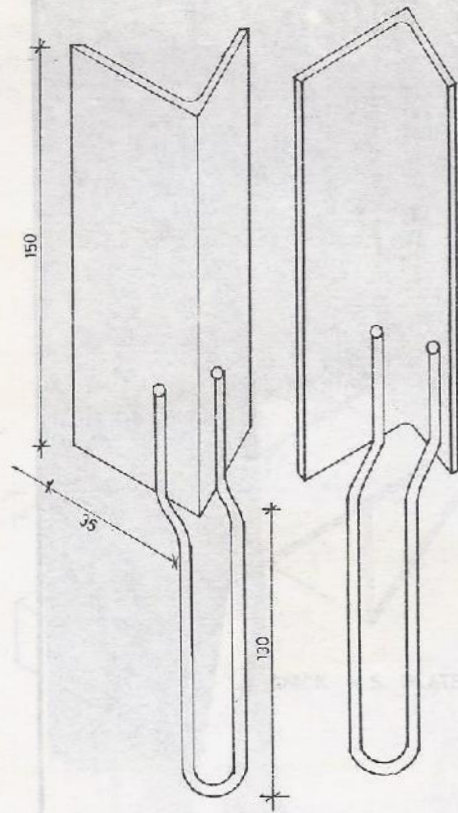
SHAPED GADGETS FOR MAKING CORNERS IN PLASTERING.
